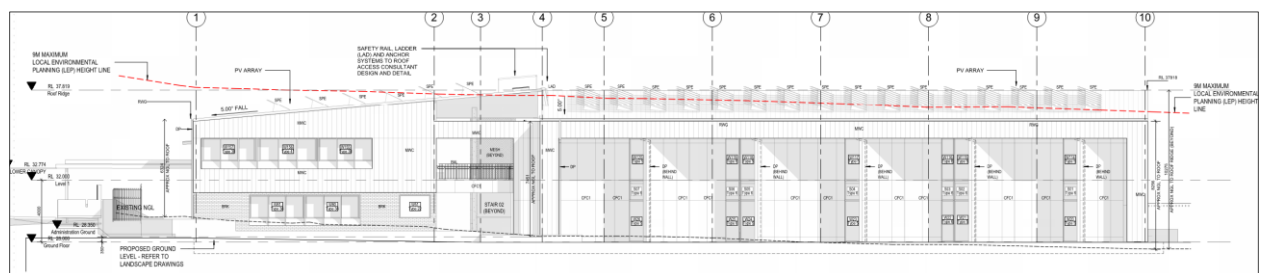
Proposed east elevation of the new school building. (Source: Conrad Gargett)
